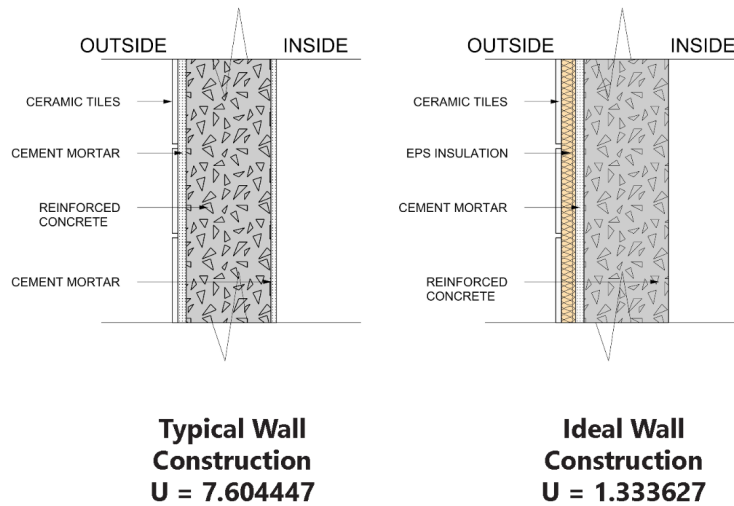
Typical Wall Construction vs Ideal Wall Construction [21]
